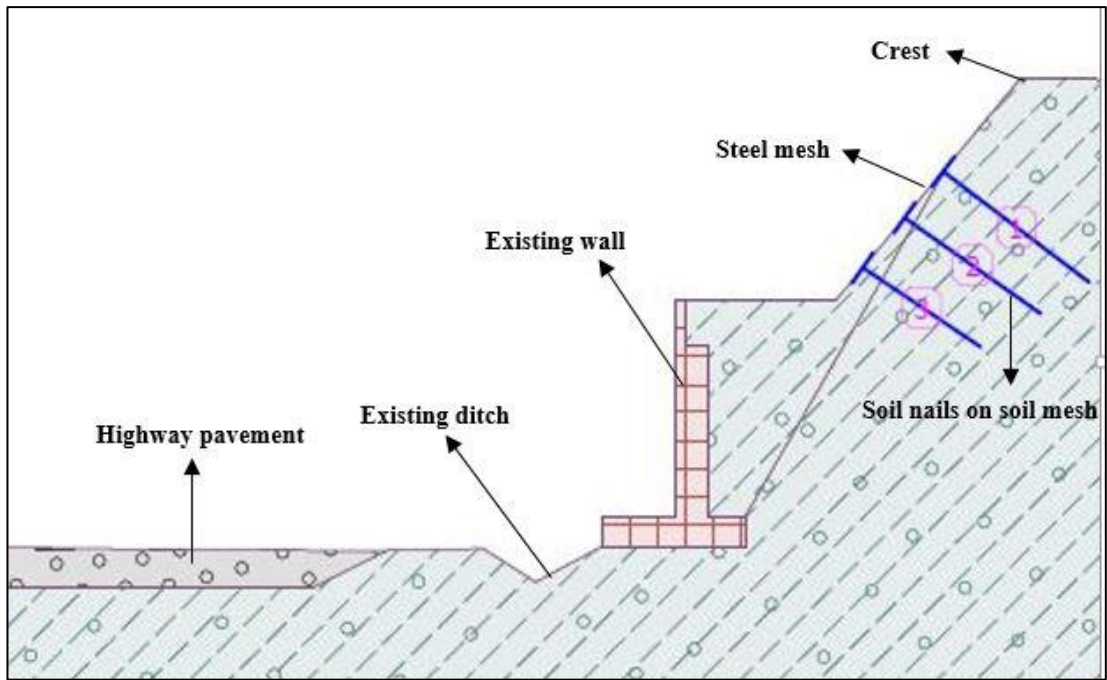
Reinforcement of backfill slope (Soil stabilization).
